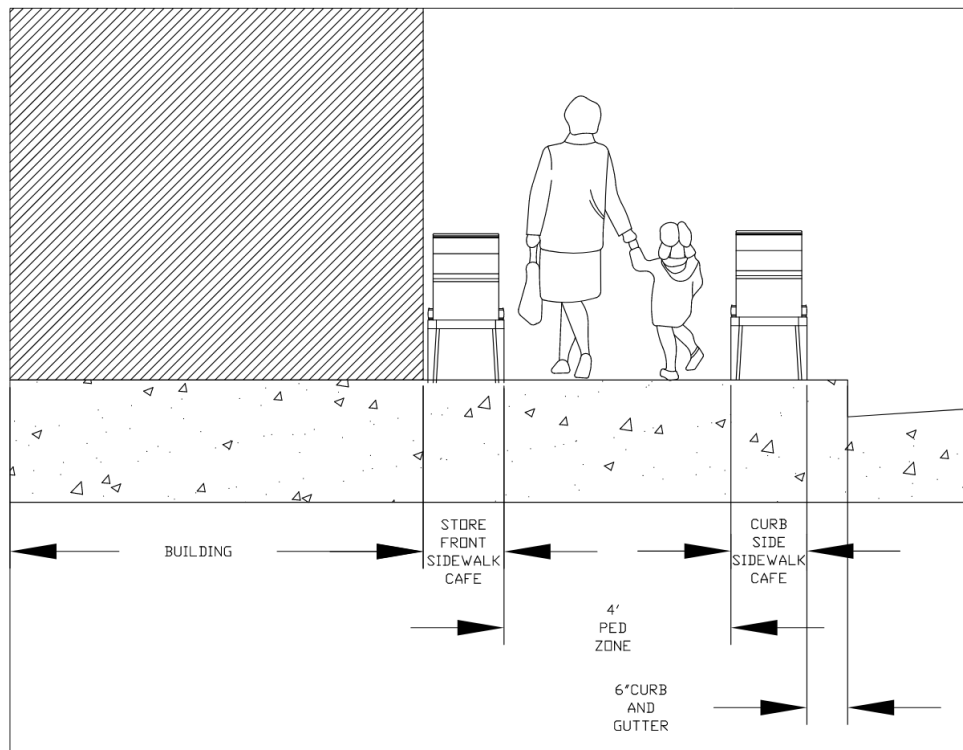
Example Cross Section of both Storefront and Curb Side Sidewalk Café
